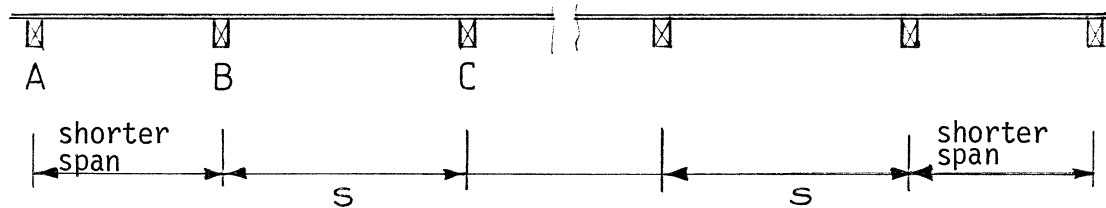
(a) Schematic Diagram of Roof Showing Batten Spacing
